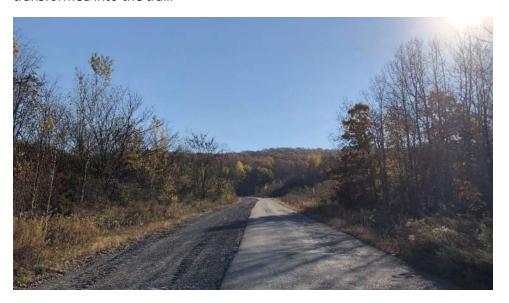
Southeast view Hall Road looking southeast at the rail corridor crossing. The trail will cross this private road along the old railroad alignment.
